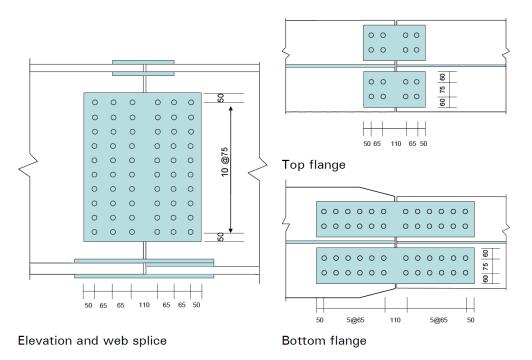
Spliced connection between the pier girder and span girder of bridge made of 1.4462
